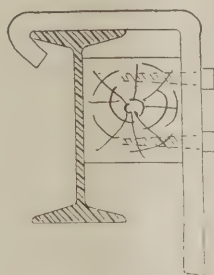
Showing How Hanger Too Deep in Clip for Flange Can Be Used.
